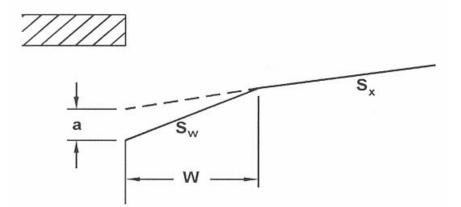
Depressed curb opening inlet (Brown et al., 2001).
